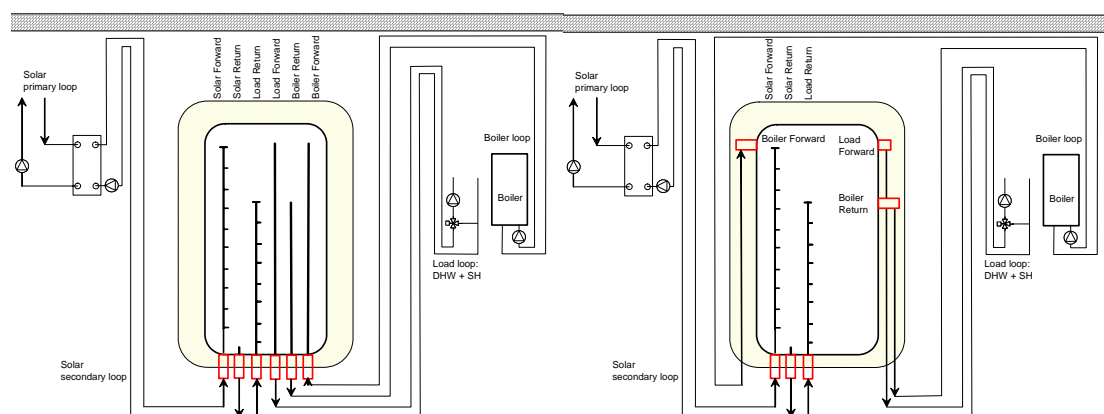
Solar combisystem with pipe connections at the bottom (left) and pipe connections at the tank side (right).
